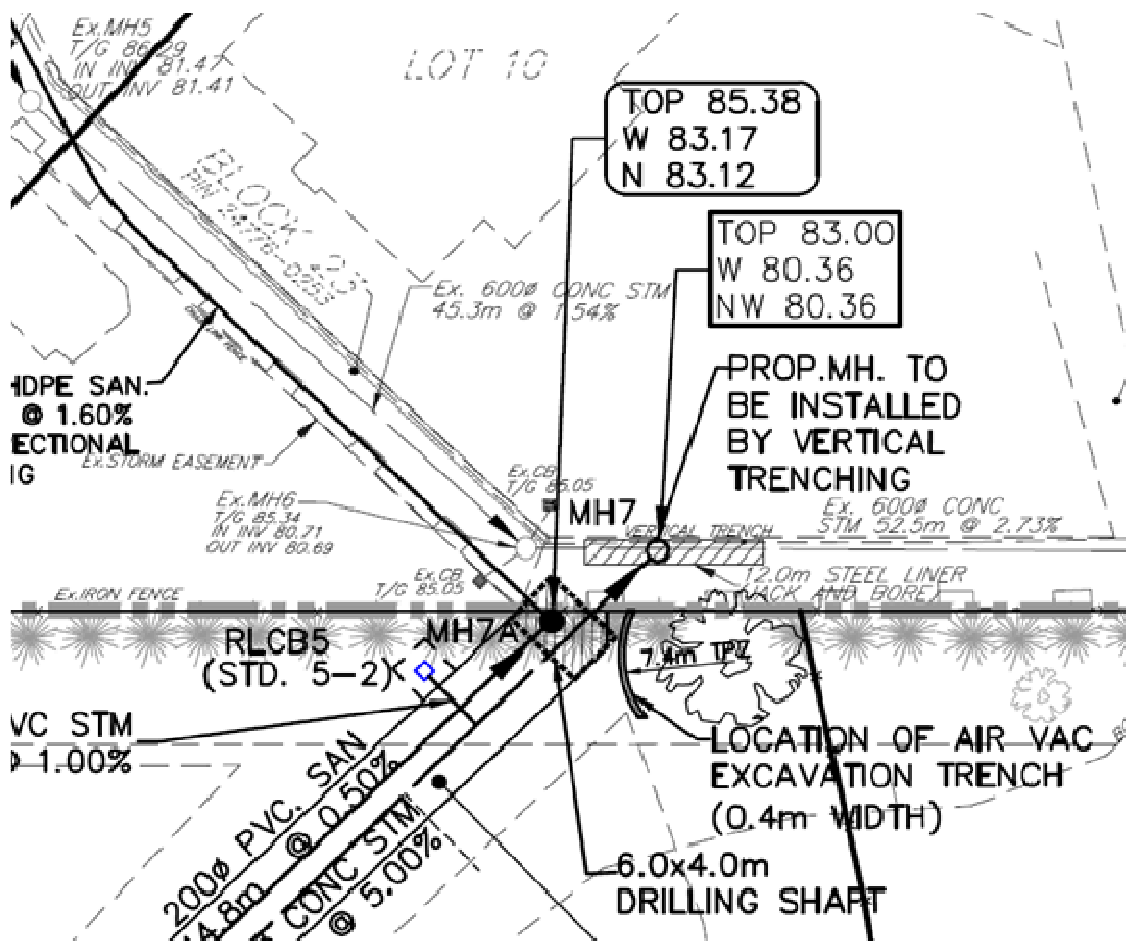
Extract of General Plan with Location of Services and Air Vac Excavation Trench
